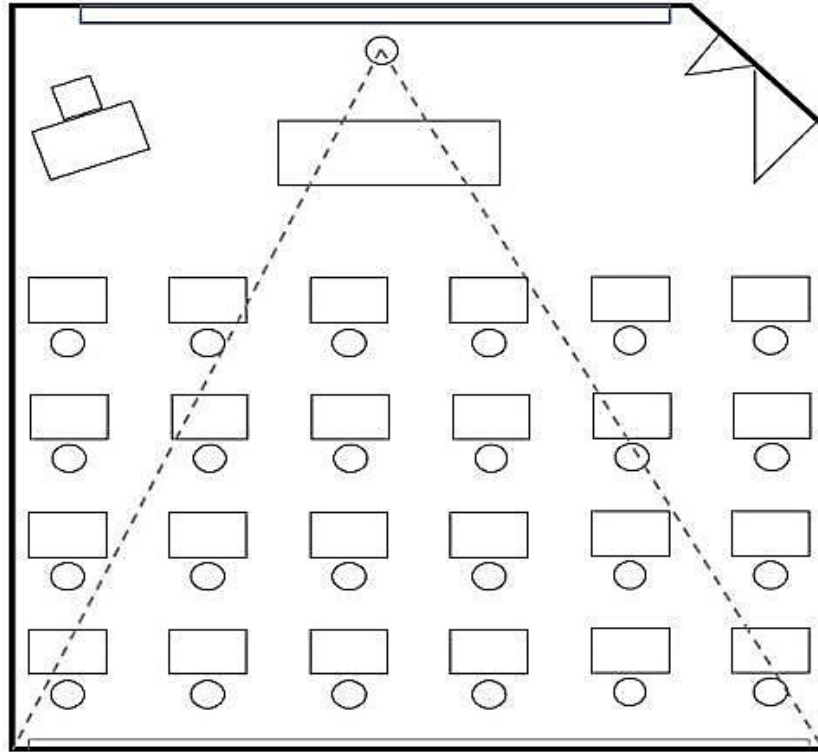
Typical Layout of Architectural Drawing Room (Author 2014)
